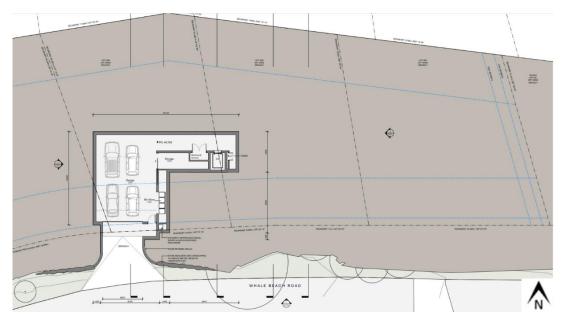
Proposed driveway. basement car park and elevator shaft, Extract from Basement Floor Plan (Source: Drawing No. 1100, Rev. A)
